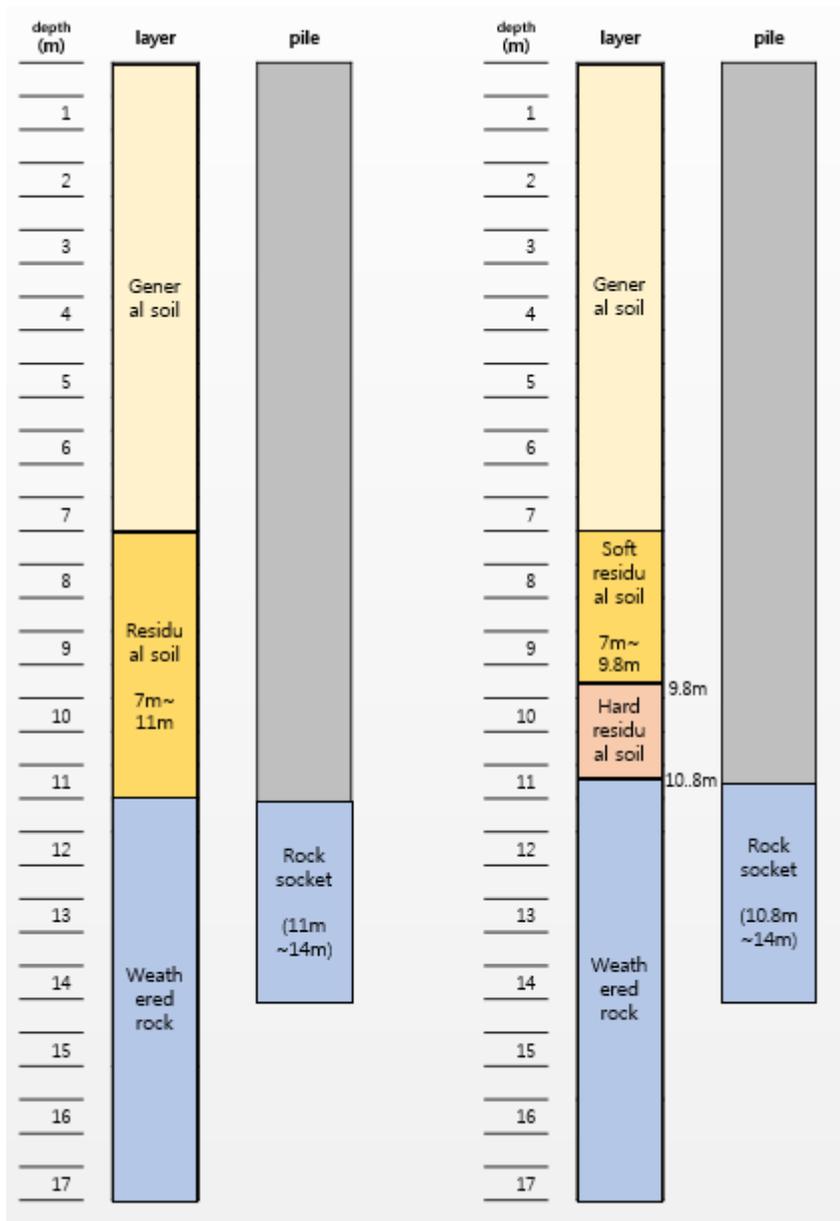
Section view of the subsurface layer for pile No. 9 before and after Modification
